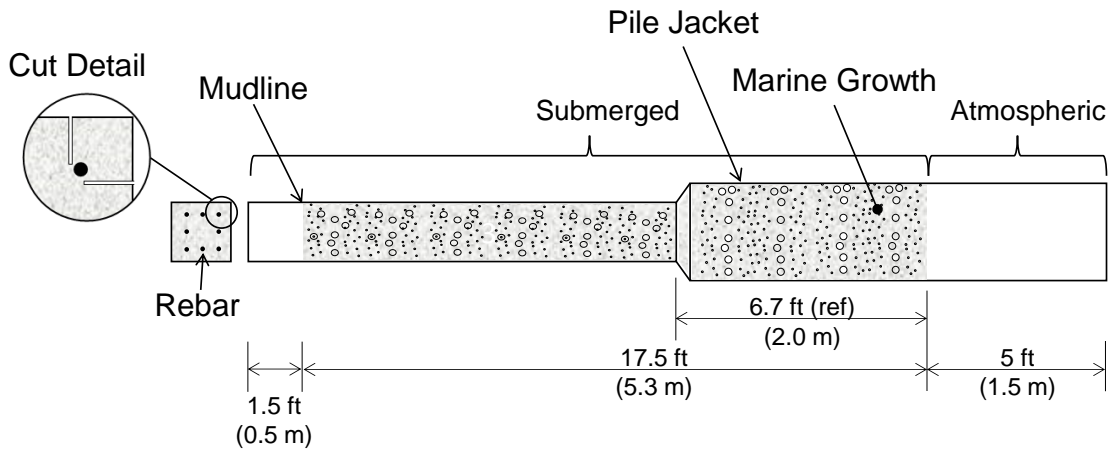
Typical configuration and dimensions of Bridge A piles. (Skyway Fishing Pier) Note indicated jacket length below the waterline (BWL).
